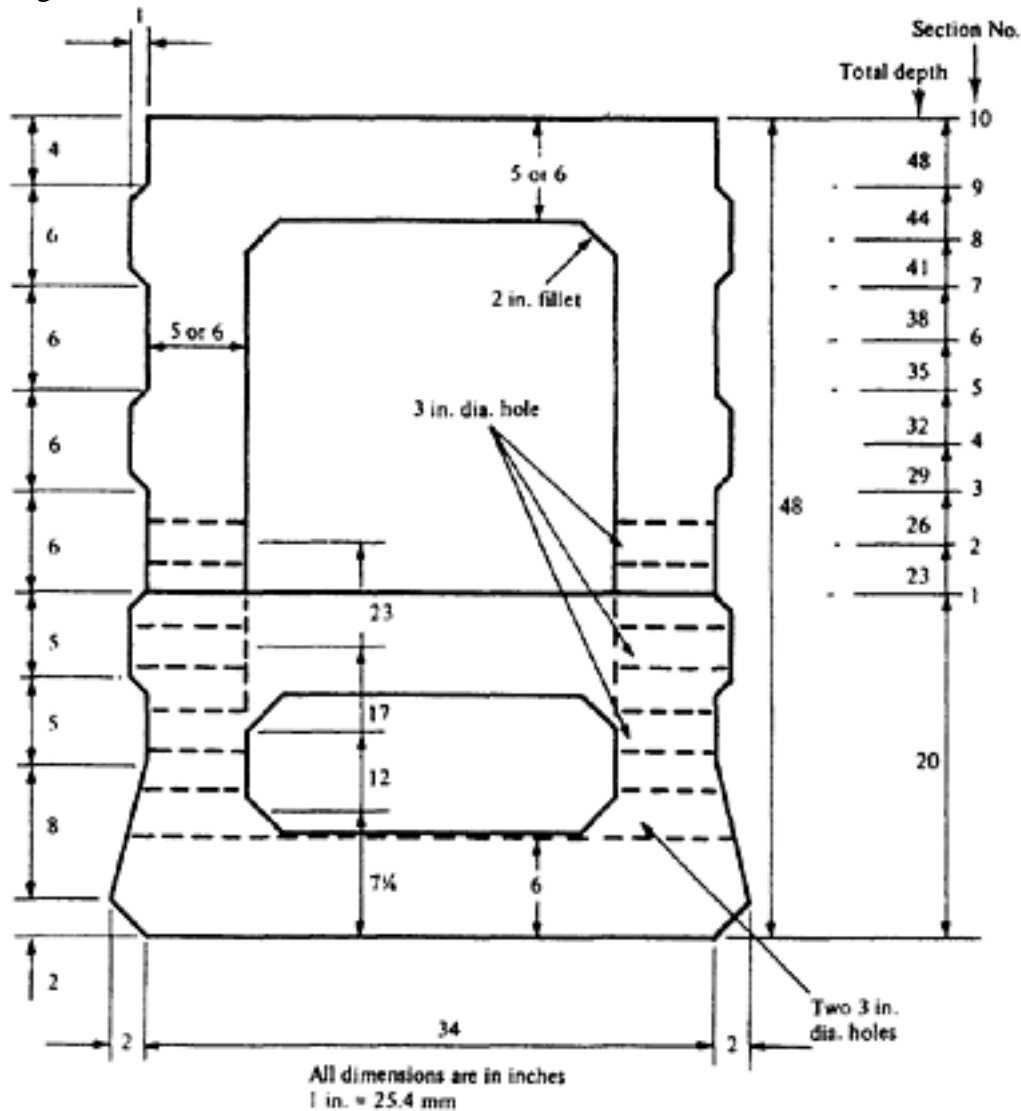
Standard box sections to span up to 85ft 0 in. (The Concrete Society)
